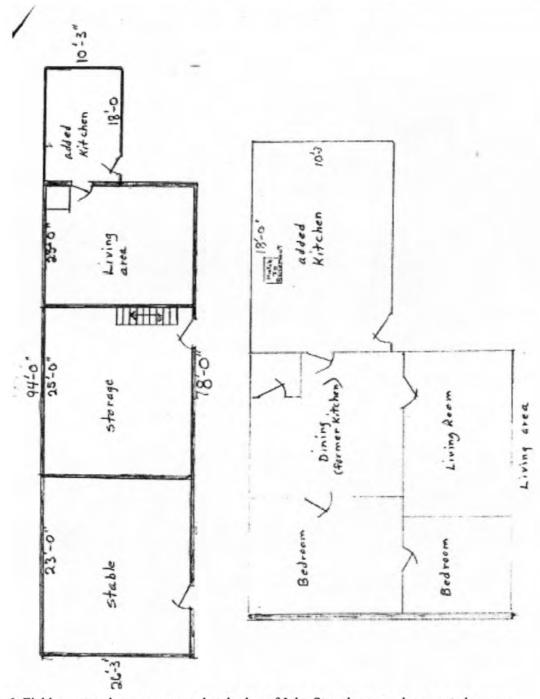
Field annotated measurement sketch plan of John Stern house and connected spaces
